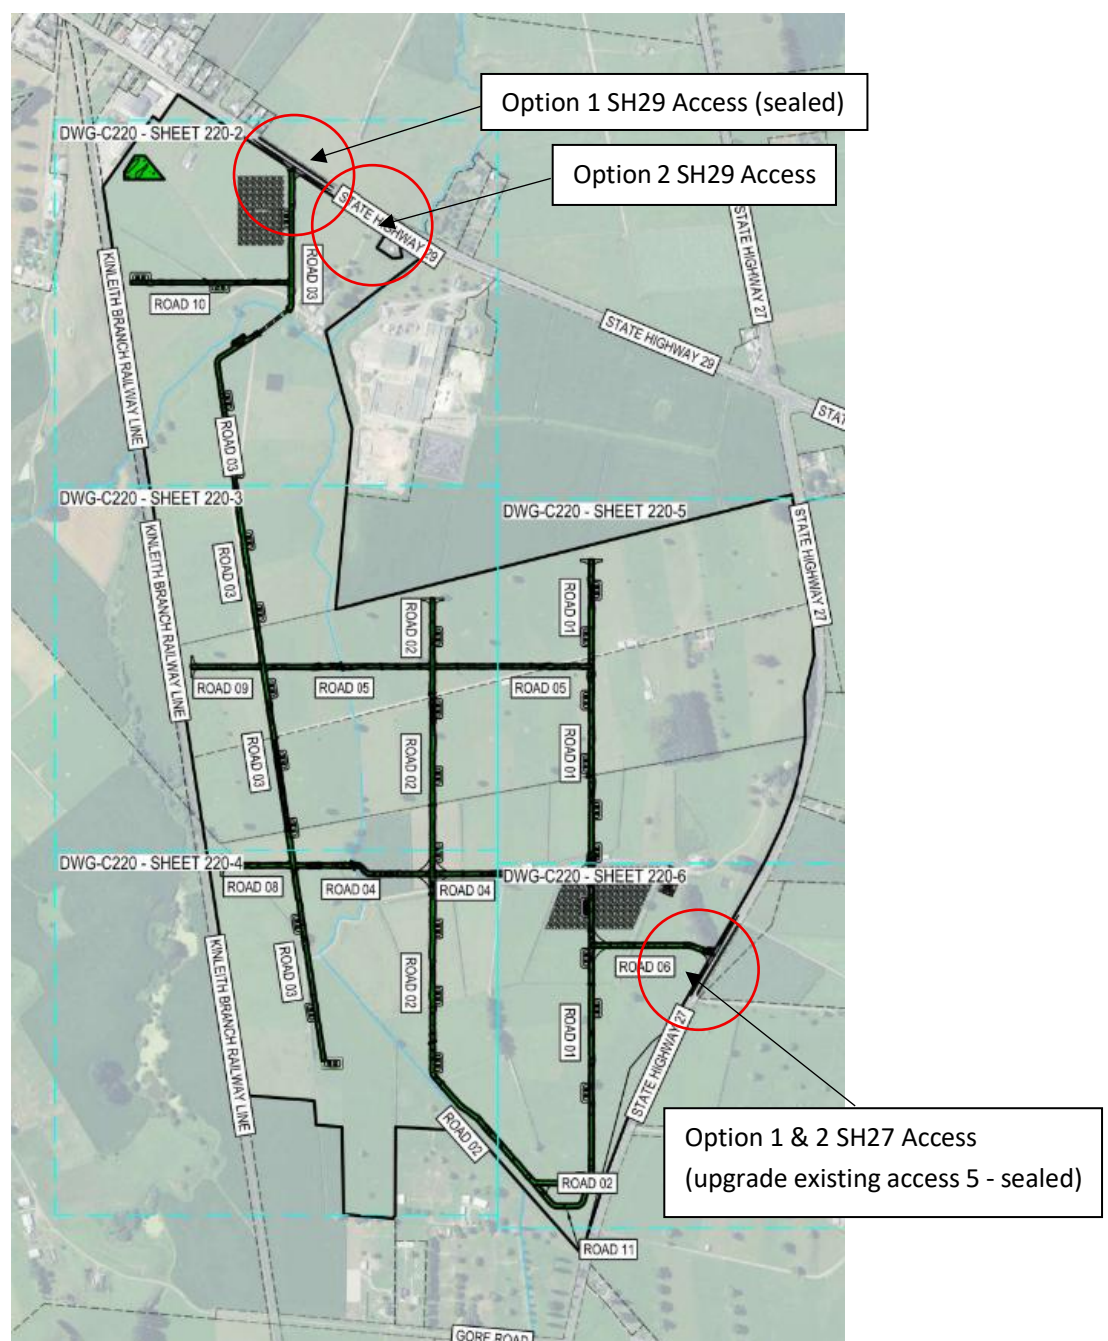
OVERALL PROPOSED SITE ACCESS AND INTERNAL ROAD LAYOUT
